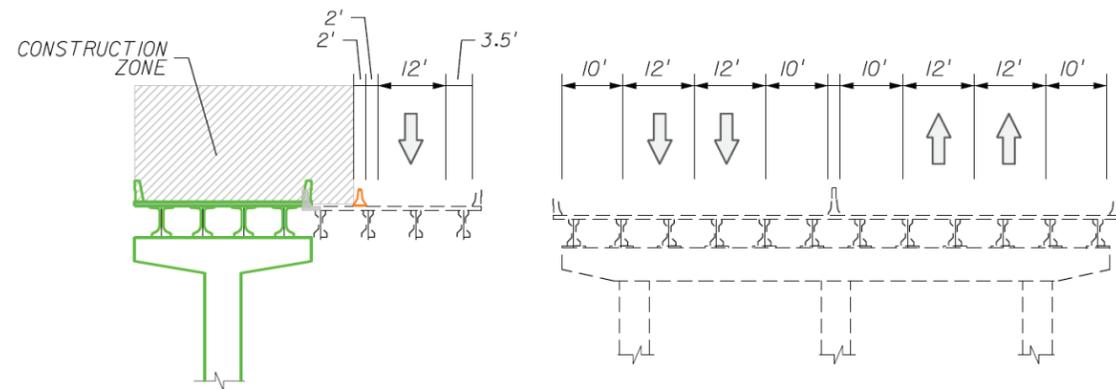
Bridge Over SW 88<sup>th</sup> Street/Kendall Drive- Partial Removal/New Bridge Construction
